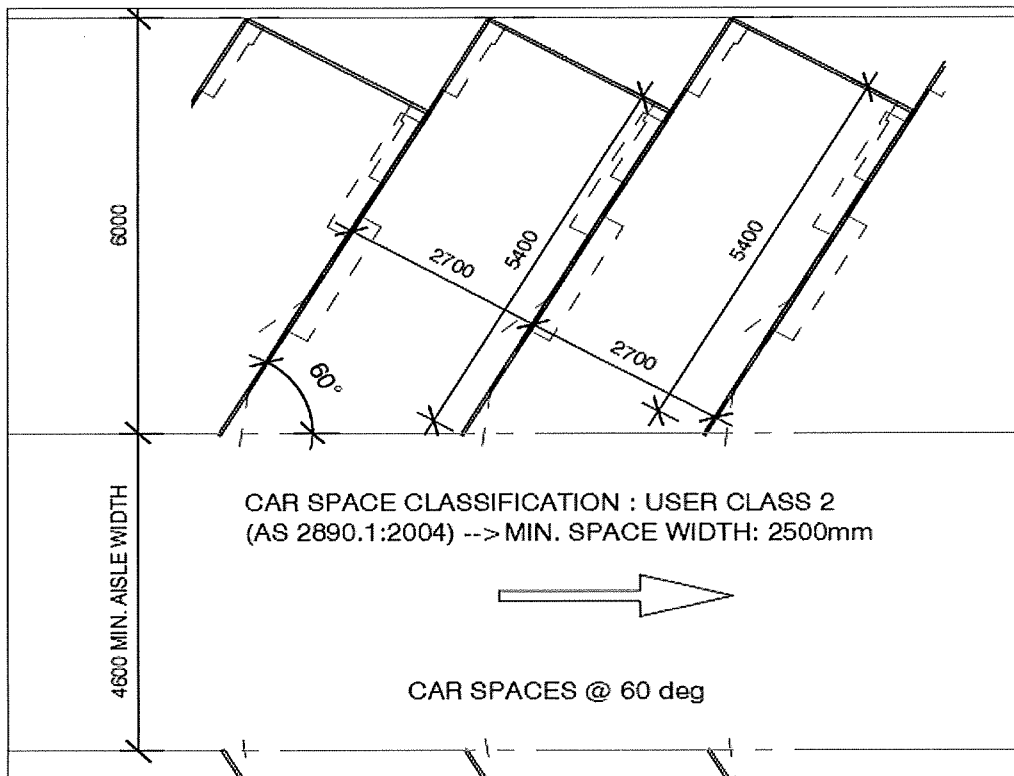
Proposed car parking alignment (Source: Applicant's documentation)
